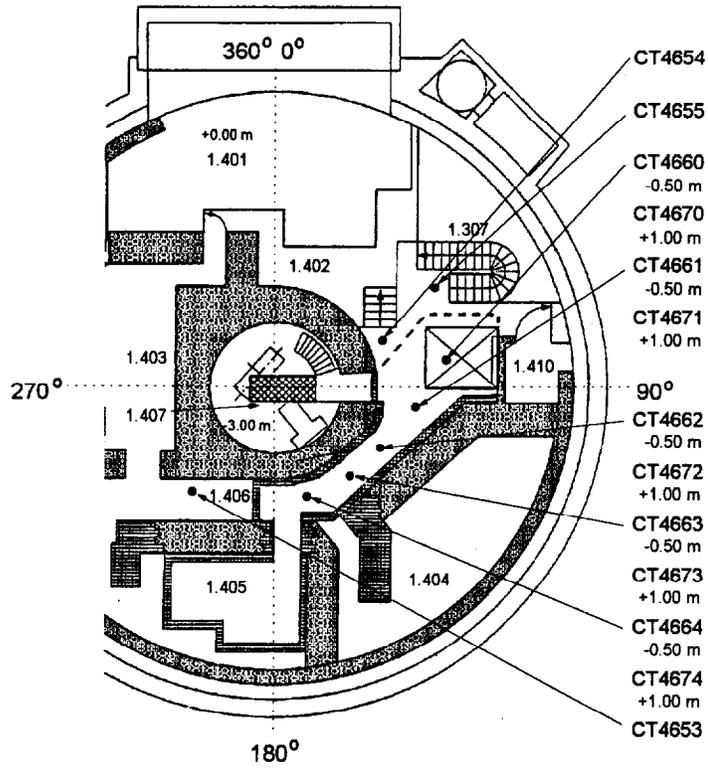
Fire Hallway at the +0.0 m Elevation for T51.1
